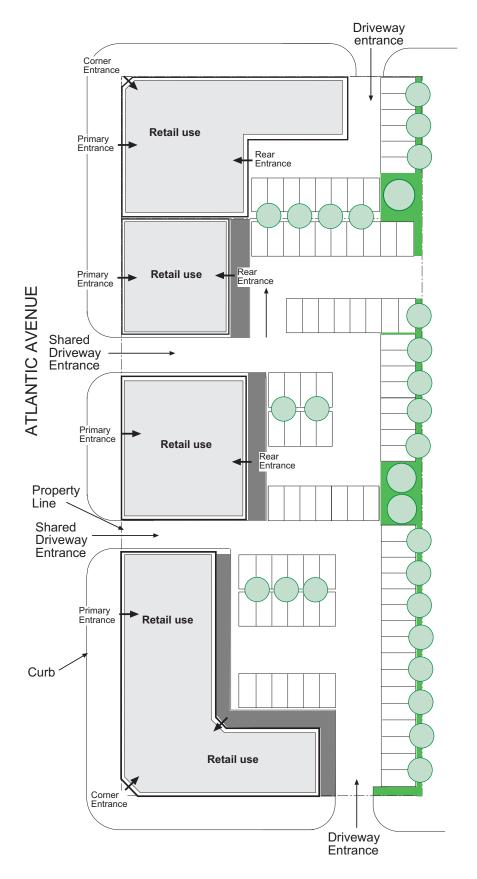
Typical block plan: Transition (Mixed-use) Subarea
